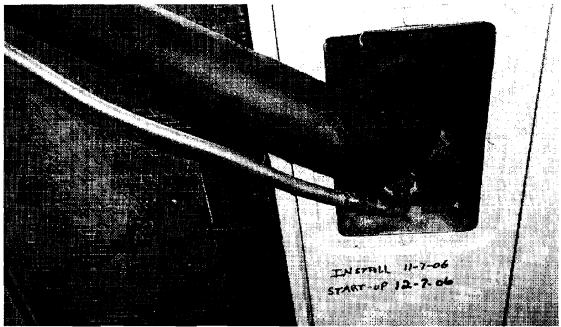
Photo of blackened copper pipe outside of second floor air handler.
